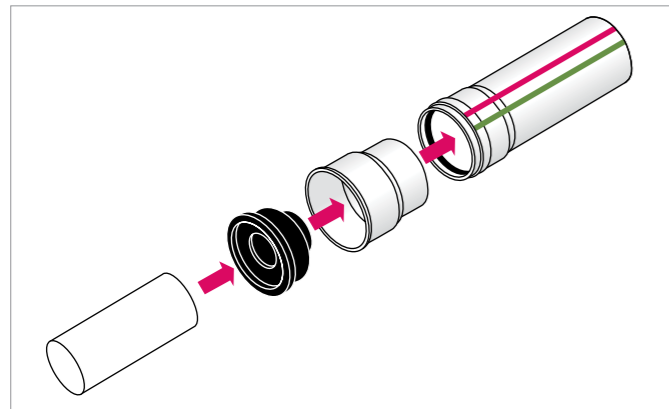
RAUPIANO PLUS connection pipe with rubber nipple.
